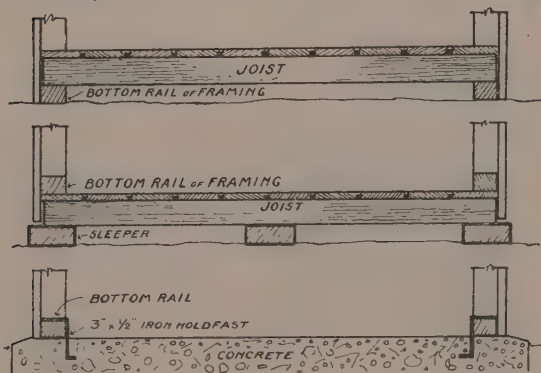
FLOOR CONSTRUCTION: THREE ALTERNATIVES.
